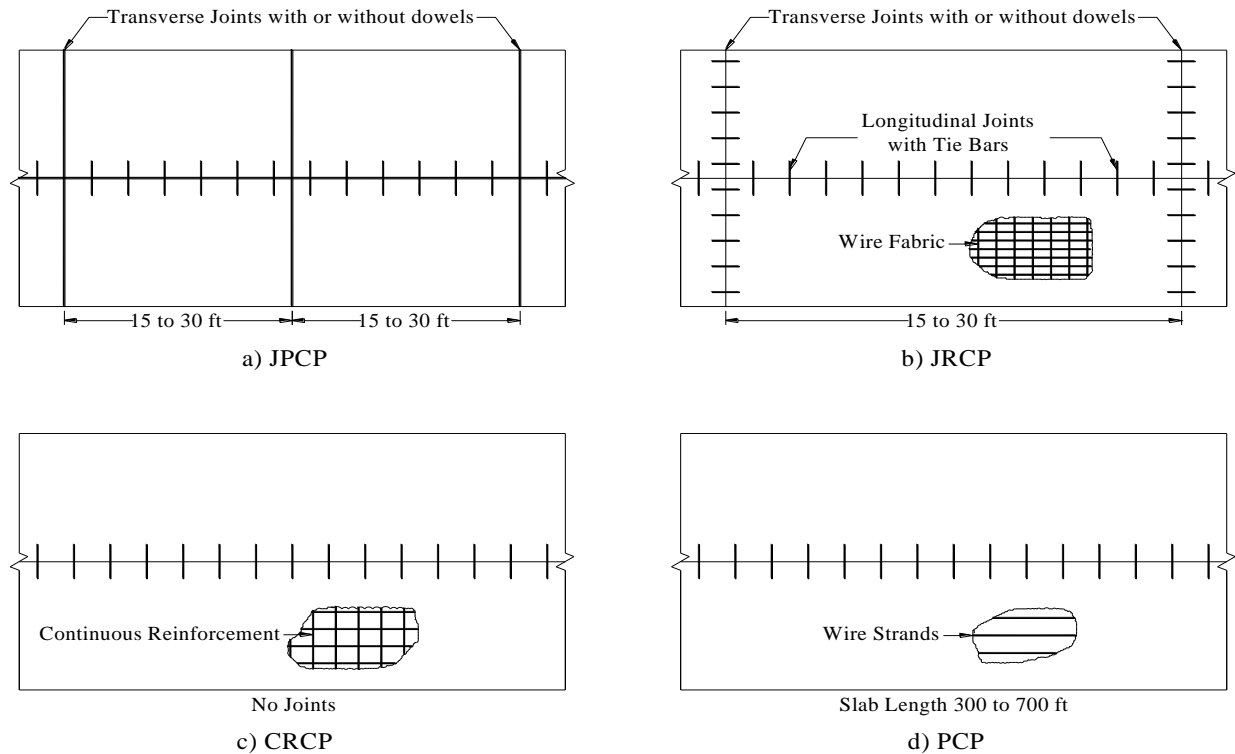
Different types of concrete pavements (Huang, 2004)
